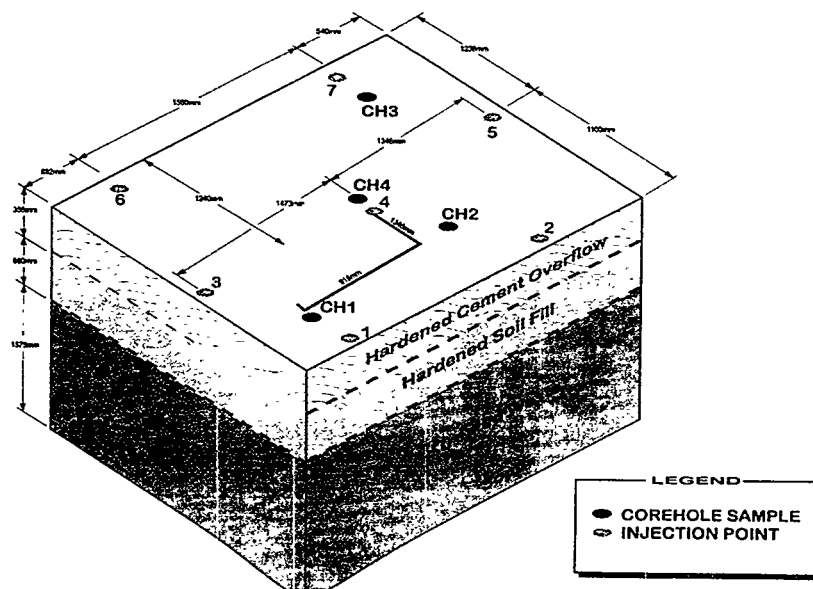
Sketch Illustrating the Overall Dimensions of Pit 2 , with Plan Location of MPI Injection Hole Pattern and Core Hole (CH) Layout Used for Guelph Permeameter Testing
